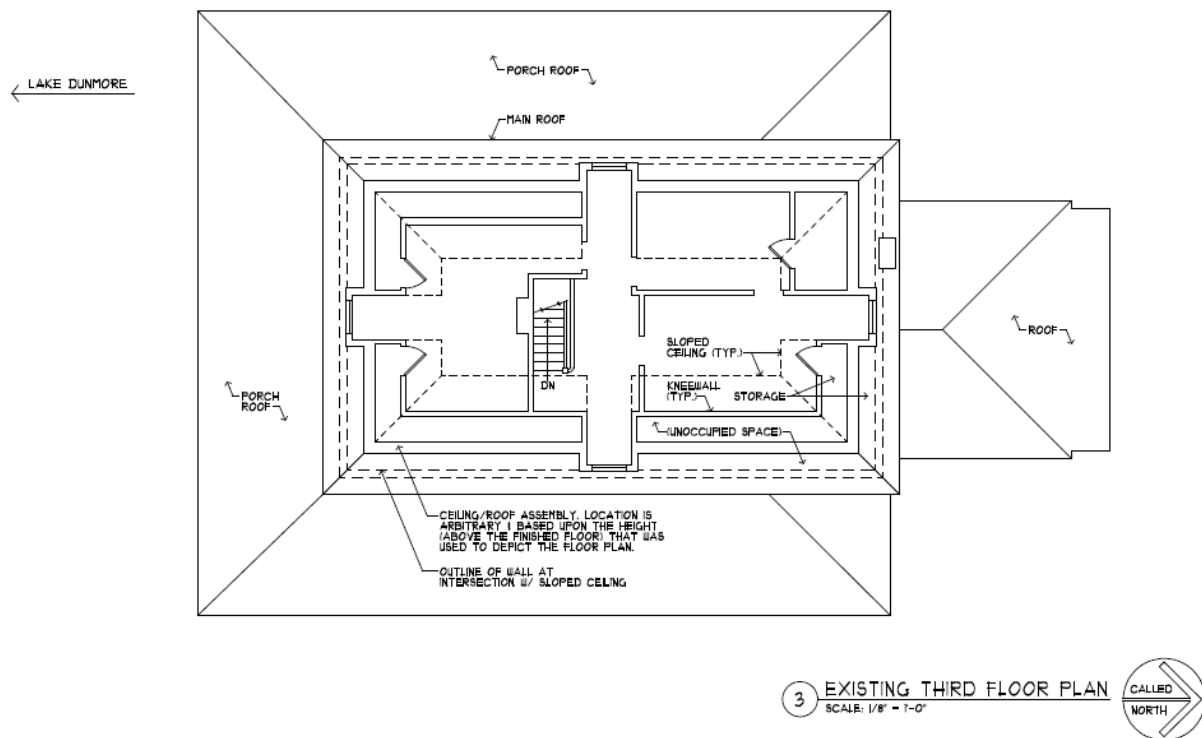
Keewaydin Manor House, existing third floor plan (NBF Architects 2016).
